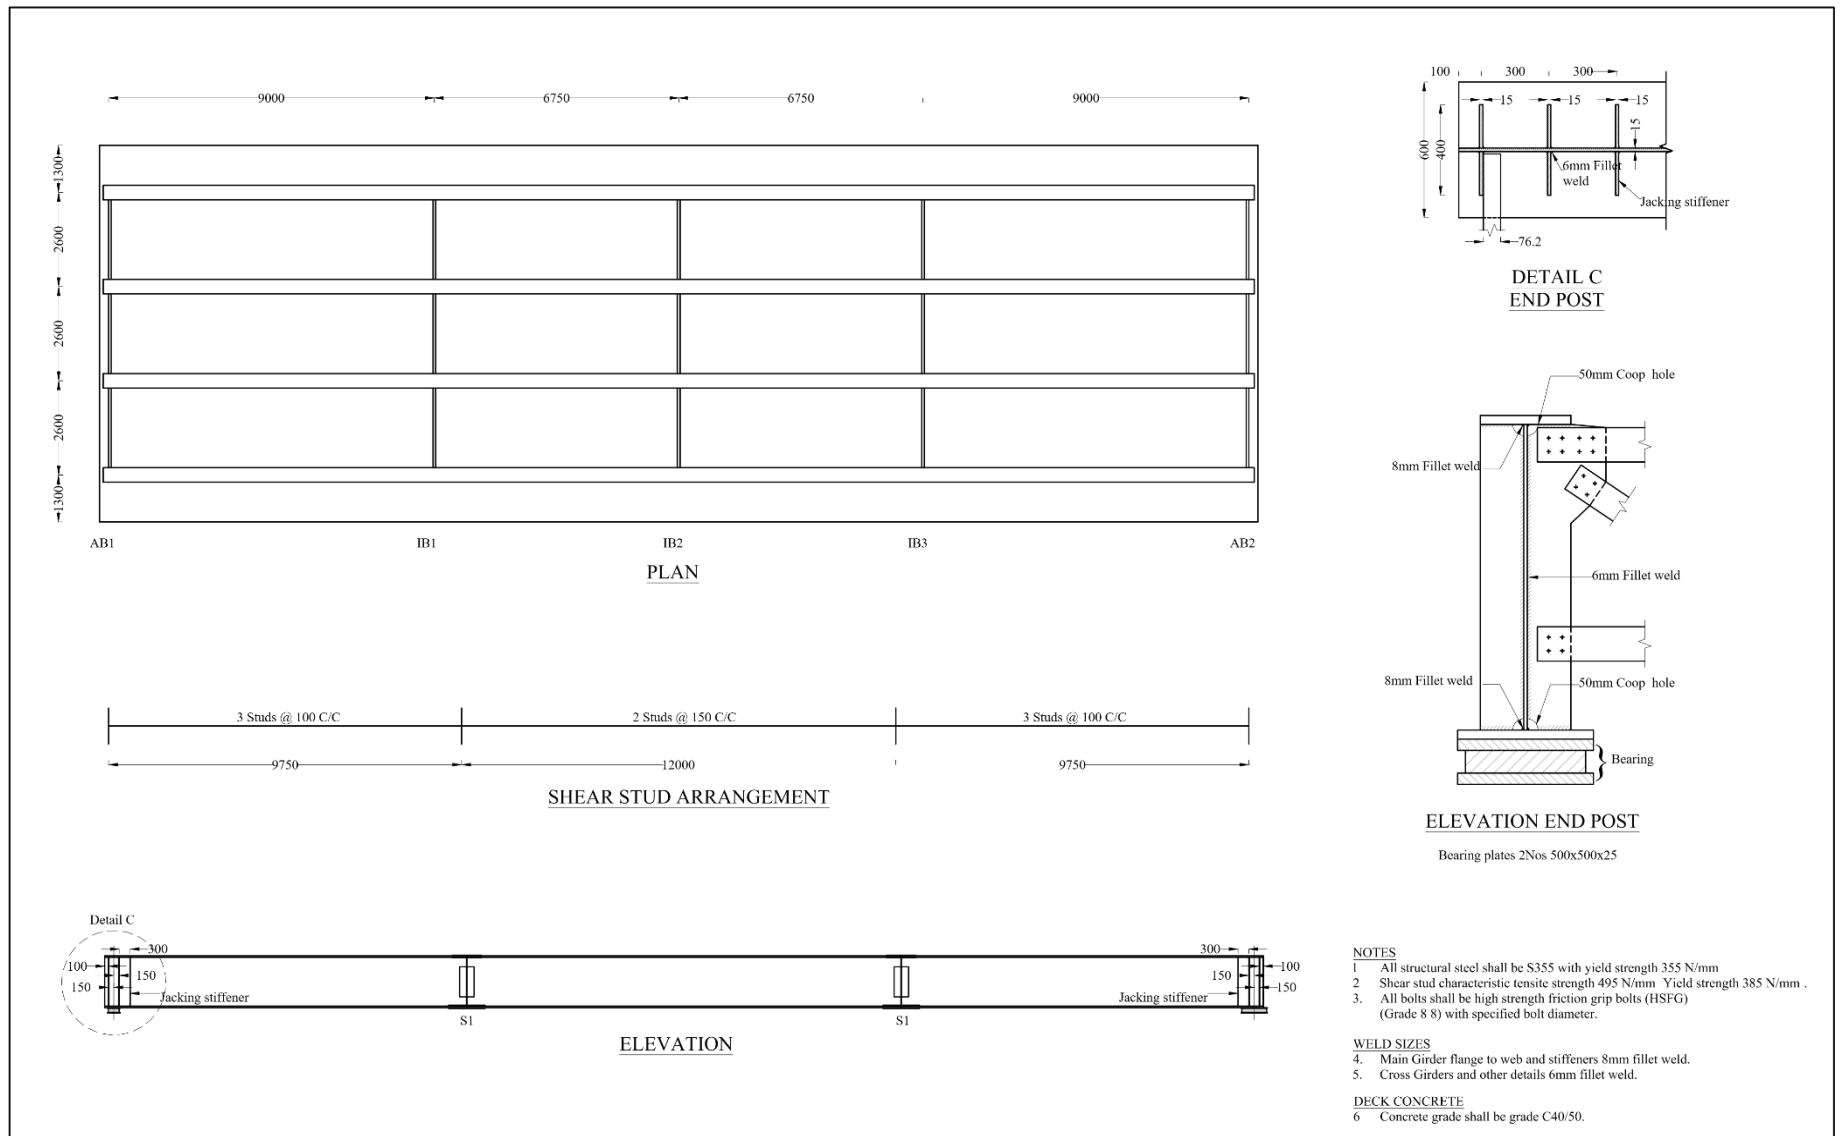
STEEL CONCRETE COMPOSITE DECK SPAN 31.5m.
